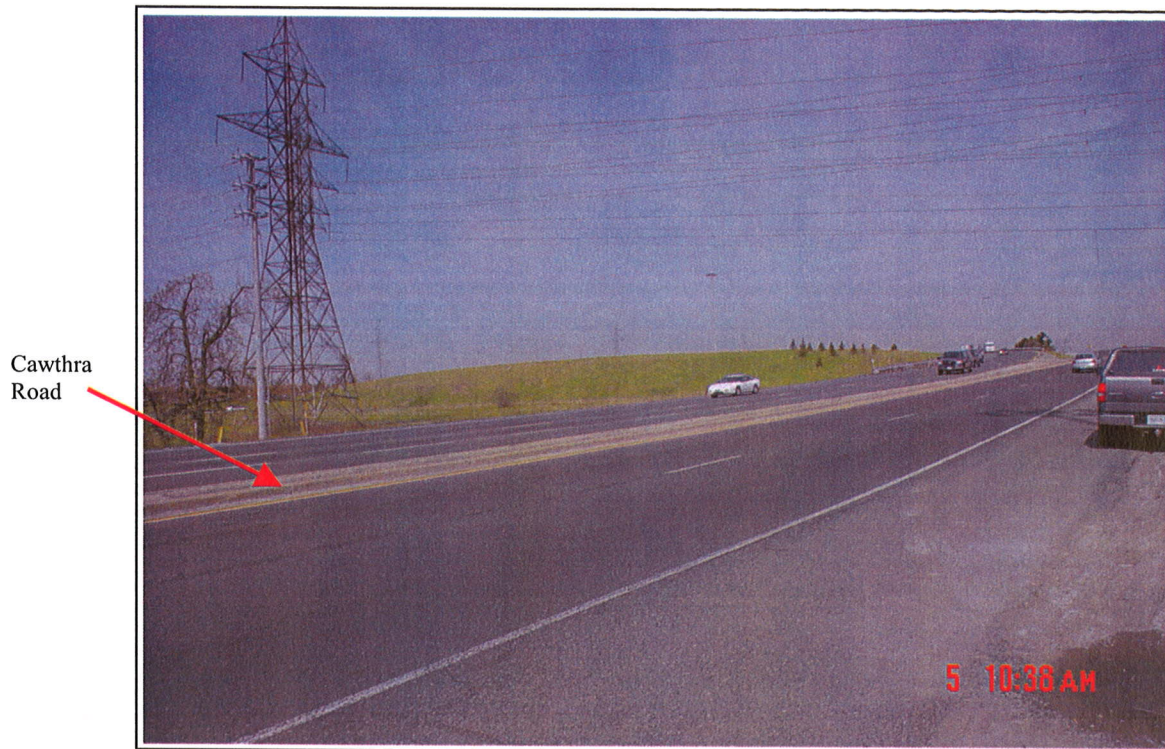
Cawthra Road just north of Eastgate Parkway, facing north
